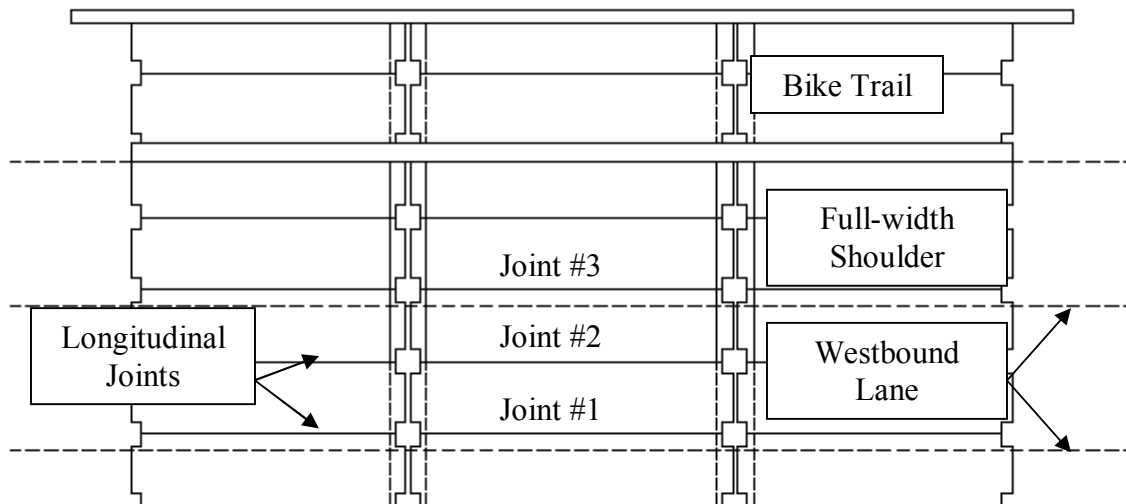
Plan View of Stage 1 of the Bridge Construction of Mn/DOT Bridge No. 13004 highlighting the Instrumented Joints
